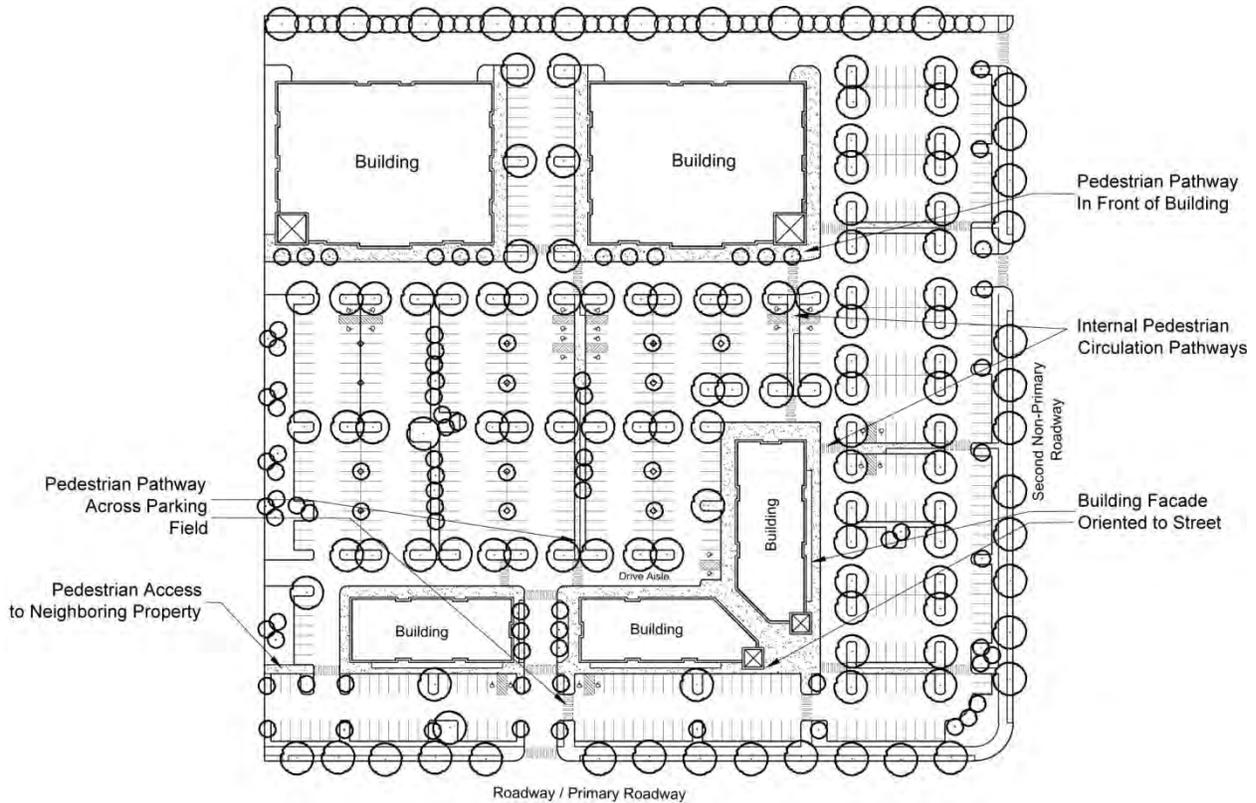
(d). – Site Layout - Pedestrian Standards
